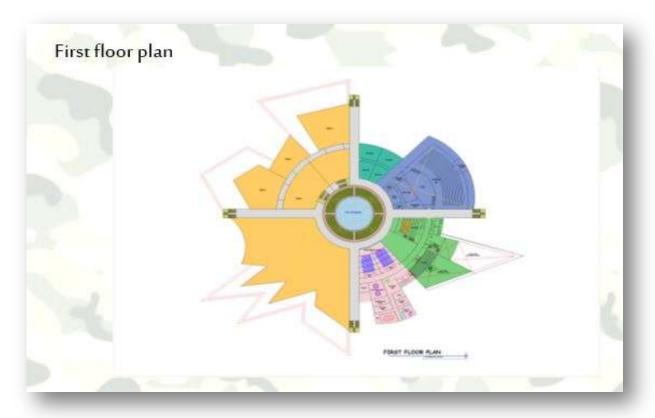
First Floor Plan of the Proposed Civil War Memorial Museum
